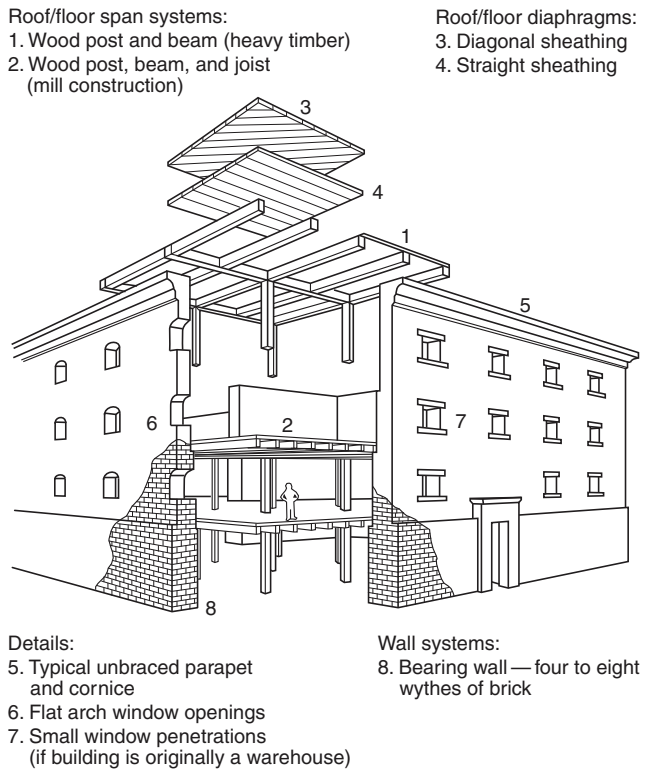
(m) Unreinforced Masonry Bearing Wall, Example 2 of 3.
